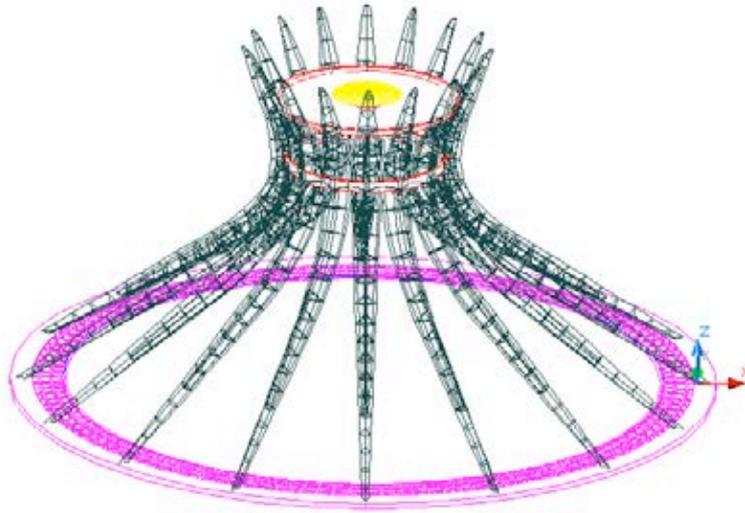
Structural system of the Cathedral; tracion ring, gridlike structure, piers, compression ring, and roof slab (Pessoa, 2002, p. 11)
